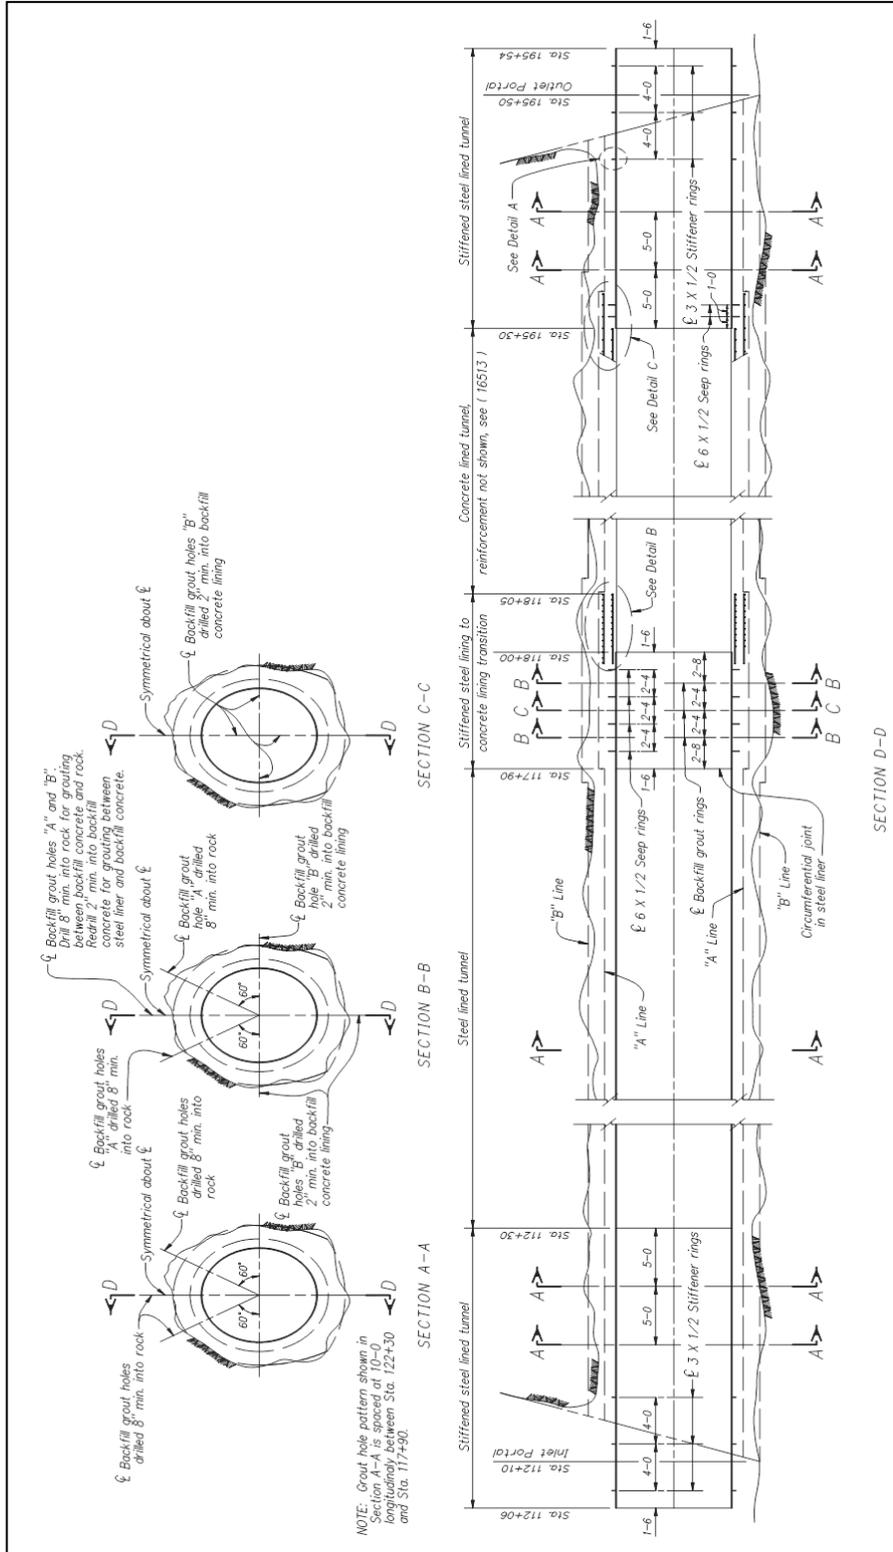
Steel-lined tunnel – sections.
